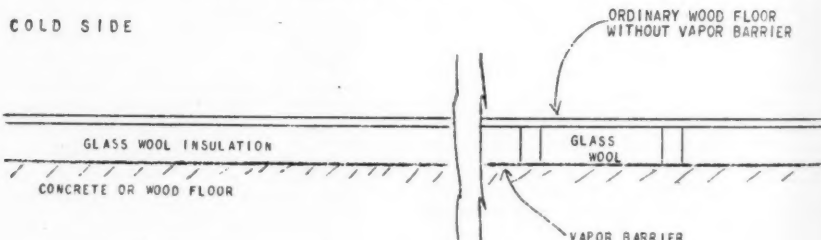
Showing the type of construction most suitable for use in cold storage rooms
